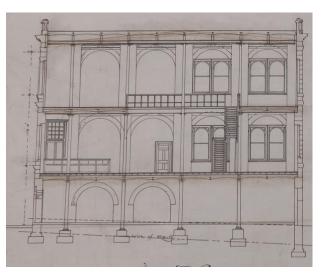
Section A-B of Strong Room (internal facing towards inner face of southern wall)
